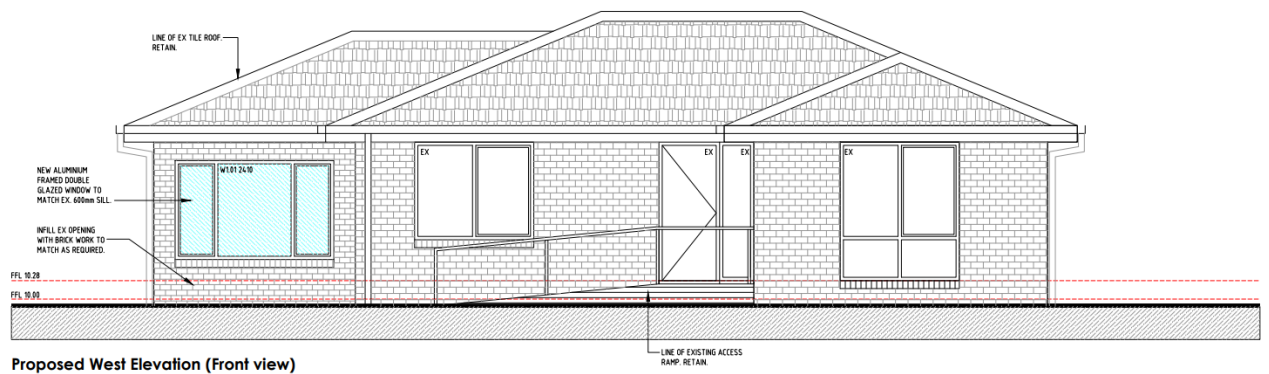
Proposed west elevation plan of 2/10 Kensington Street detailing the FFL of the proposed and existing rooms. submitted with the development application (07/12/18).
